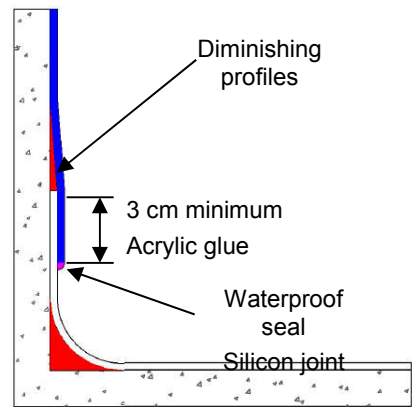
PVC flooring upstand: joint and overlap with diminishing profile or filler
